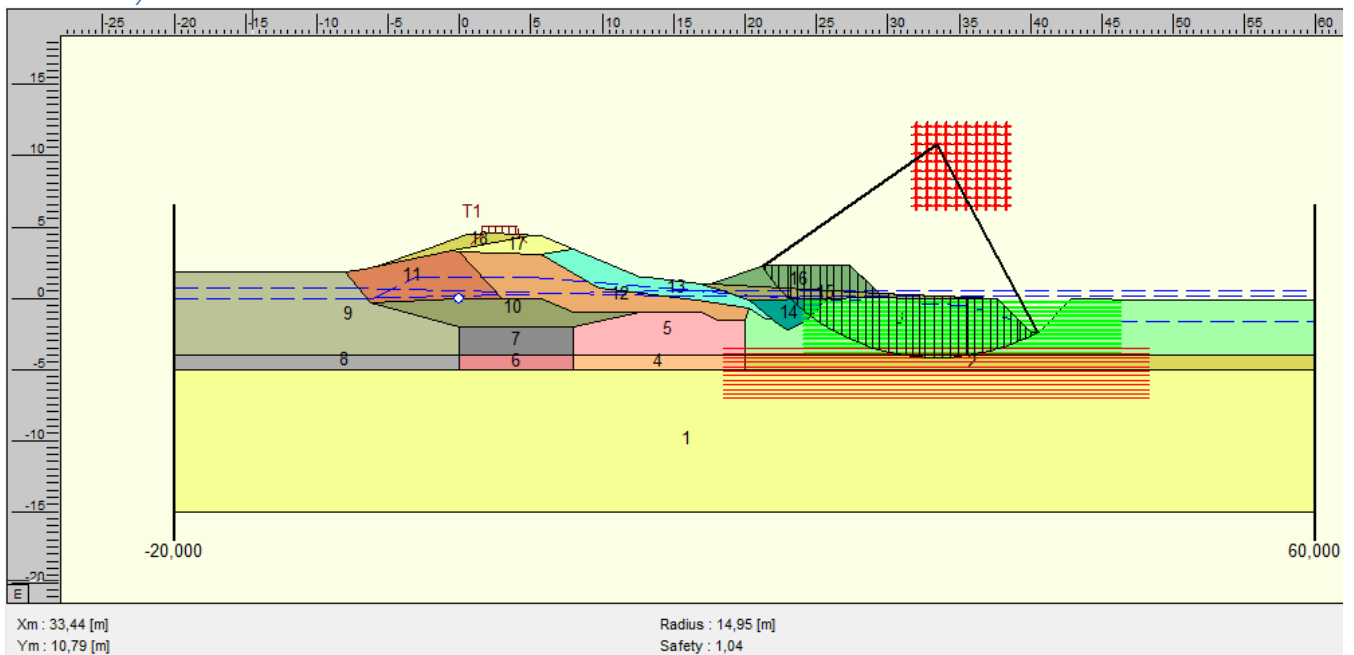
D-Geo Stability Results. Observation Water Level 5%, NAP - 0.04 m + Construction Load 5%, 2 m Height and 8 m from Ditch
